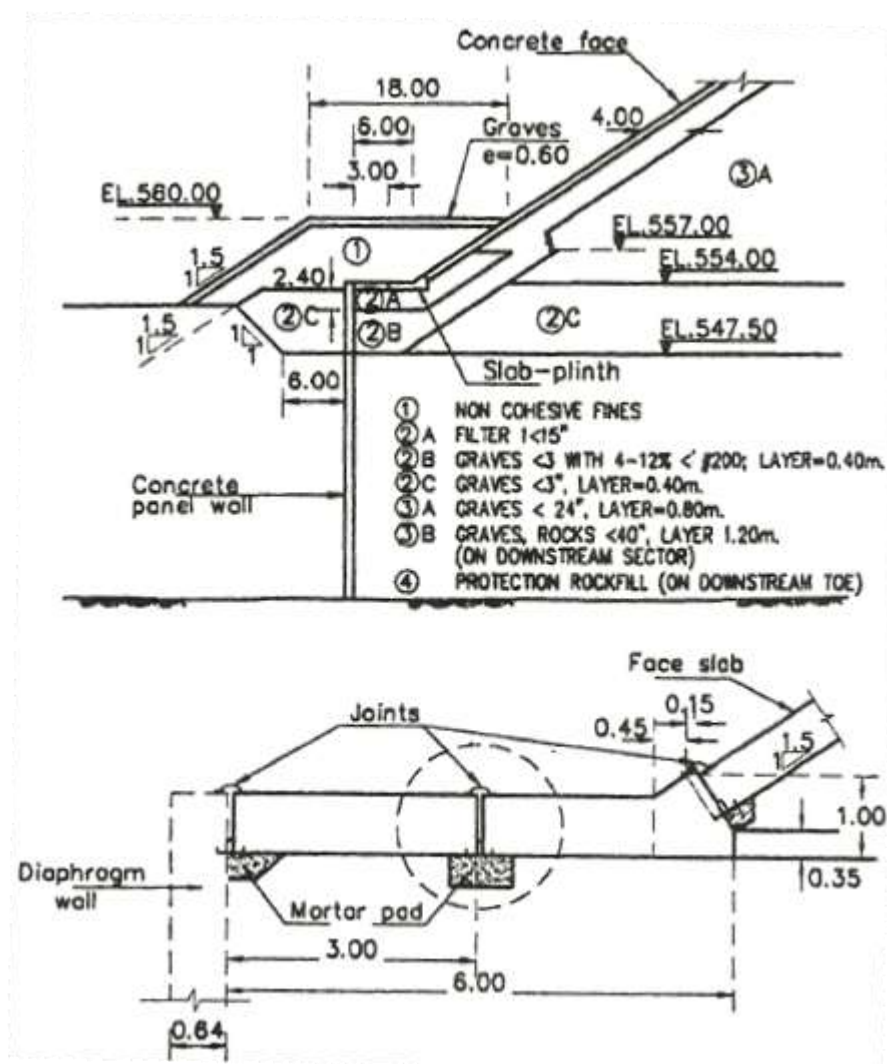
Foundation treatment and plinth design Santa Juana Dam (Marulanda and Pinto, 2000).
